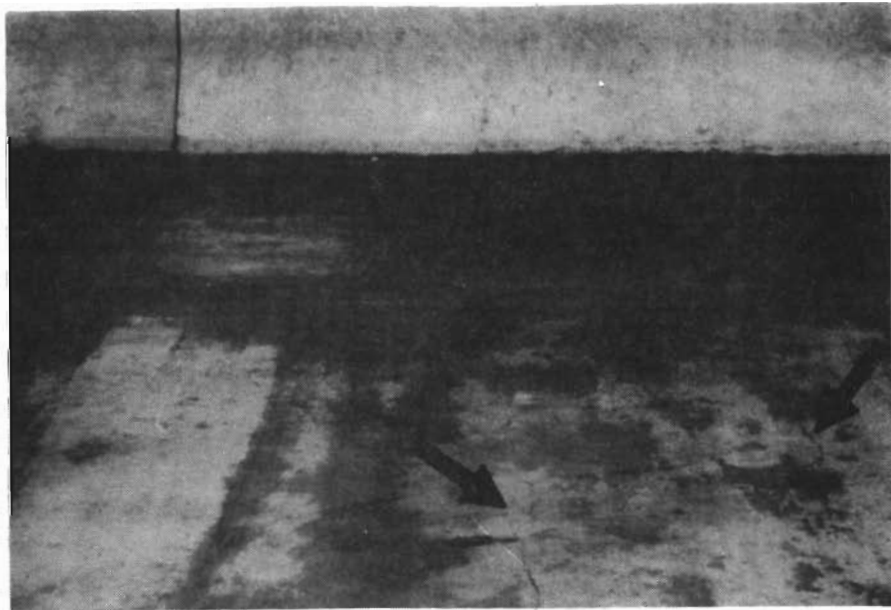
Transverse deck cracking over the wing rib edges (pocket knife shown for scale purposes)
